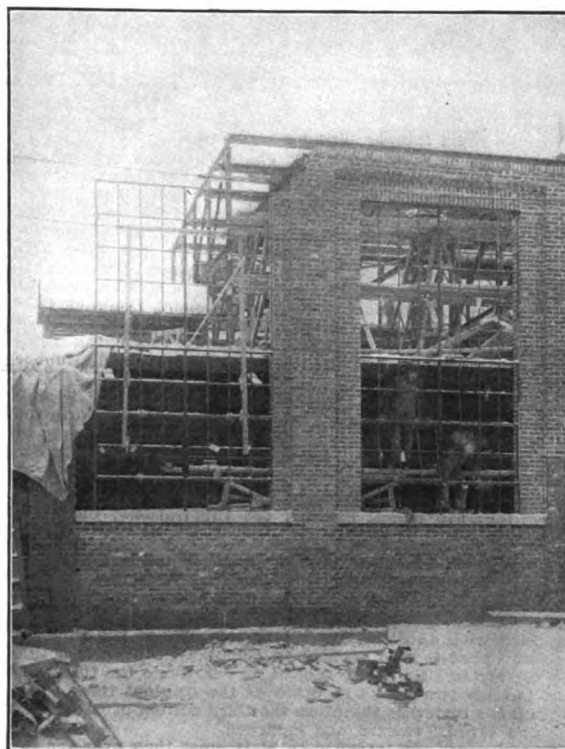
JOINING UP THE NEW AND OLD WALLS
